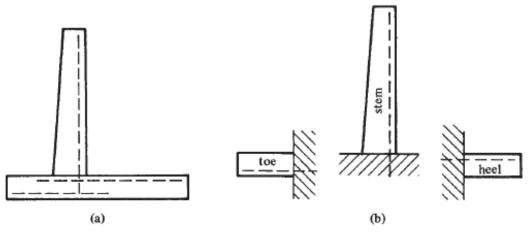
Cantilever beam model used to design retaining wall stem, heel, and toe.
